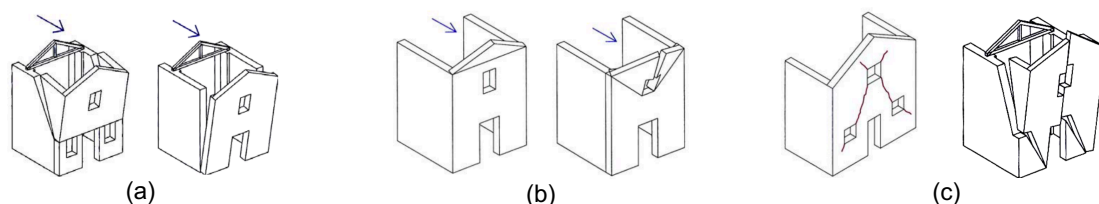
Collapse mechanisms for the facade: (a) overturning, (b) damage to the top/gable, (c) shear
